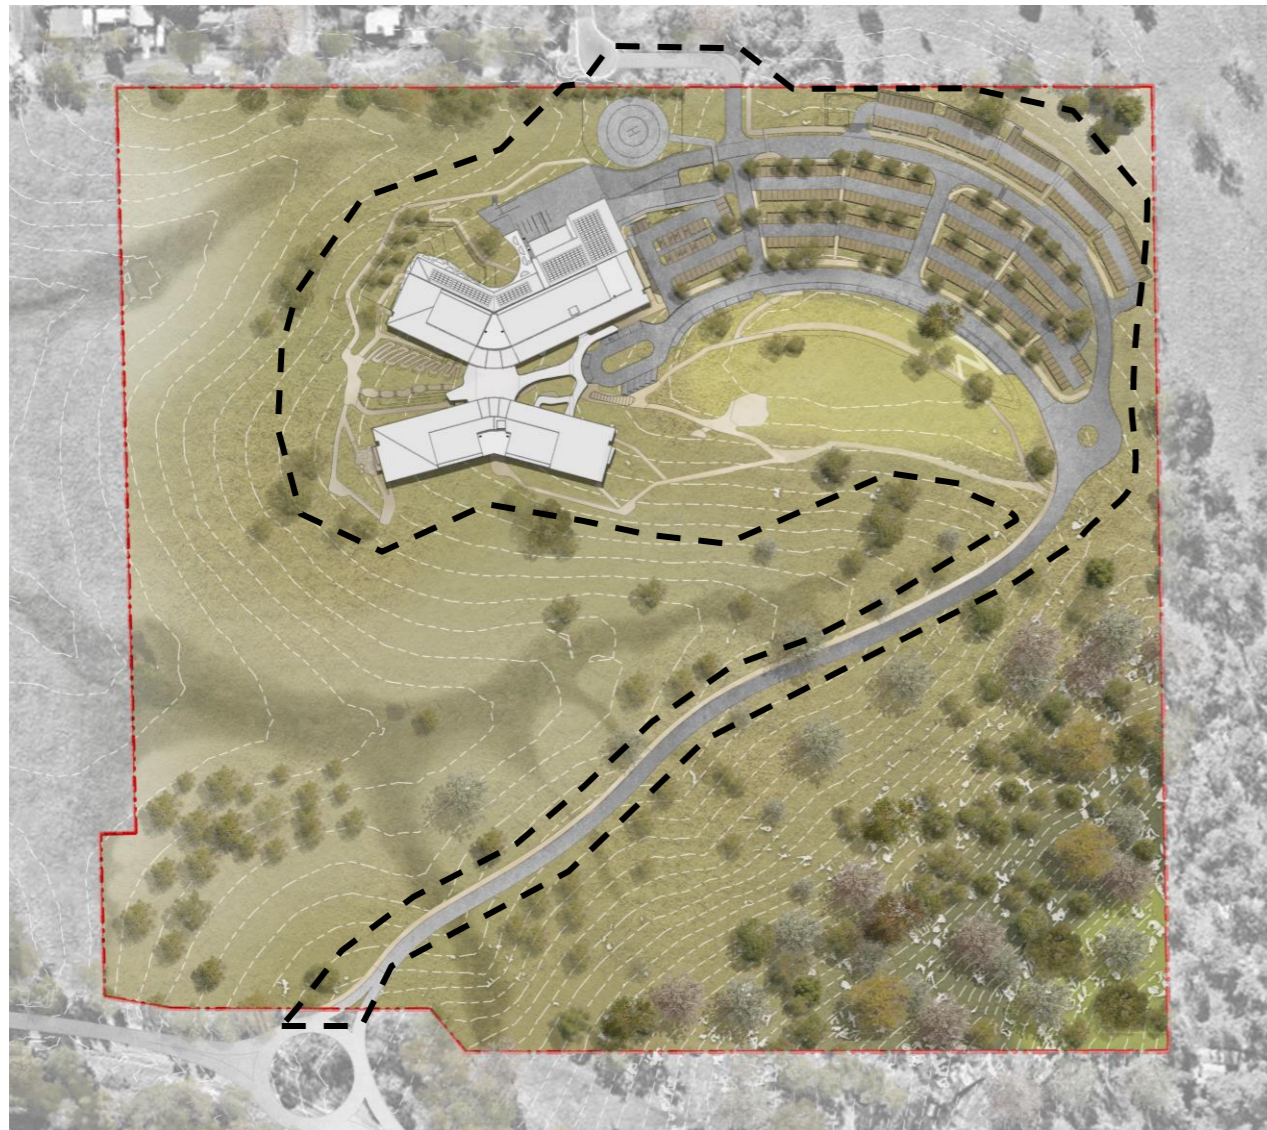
SITE PLAN – SCOPE OF WORK (APPROXIMATE OUTLINE SHOWN IN BLACK DASHED LINE)
